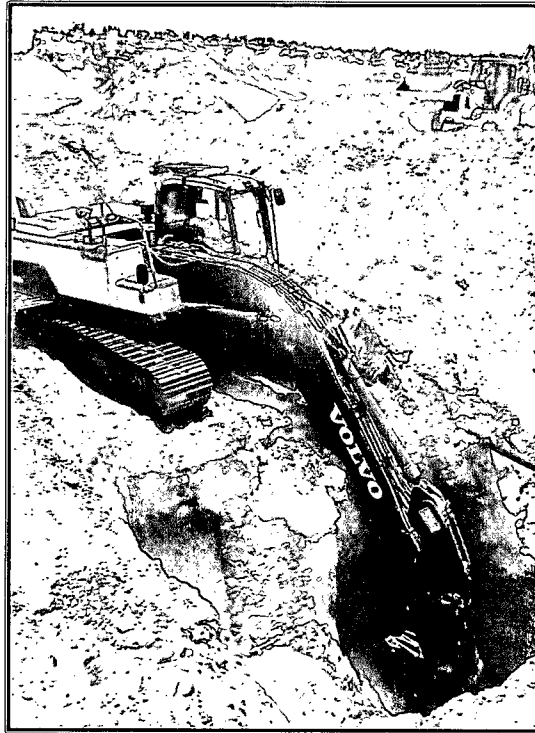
Excavation approximately 20' below the Lateral C-7 Pipeline.
